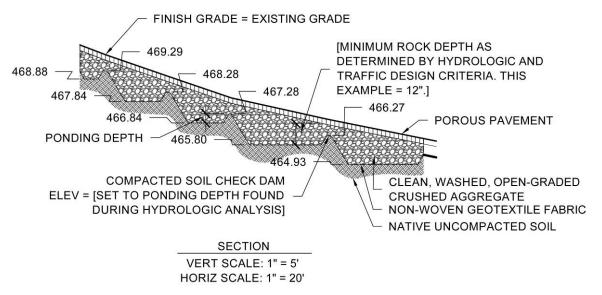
Cross section example on sloping sites. Bench flat infiltration areas down a sloping site to save money on the alternative, which is to excavate a single large flat area. Underground berms 6 inches below the pavement surface hold water back and spread it out to infiltrate before excess volumes overflow the dams during large storms. To significantly reduce excavation costs, the shape of the berms should follow existing contours, even though finish grade may not equal existing grade.
